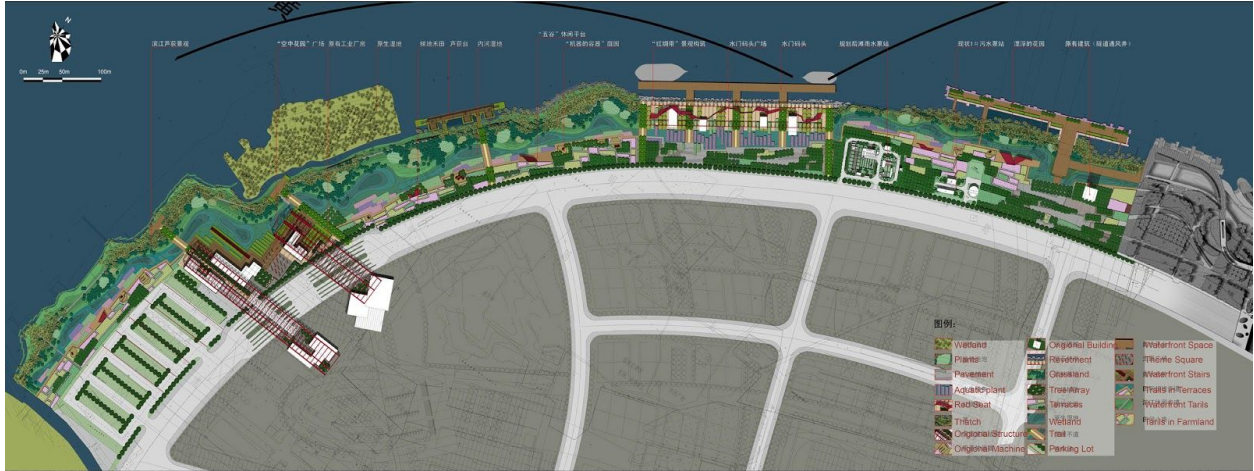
The Plan of Houtan Park (Source: Yu, Kongjian, 2015 Landscape as a Living System: Shanghai 2010 Expo Houtan Park)
